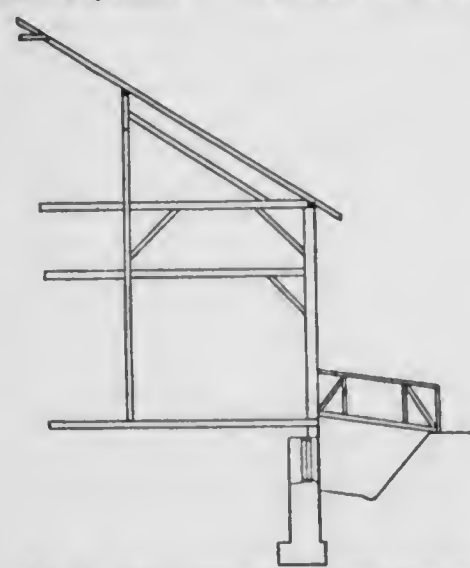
Part cross-section of bank barn wall and bank cut away to admit light and air.
